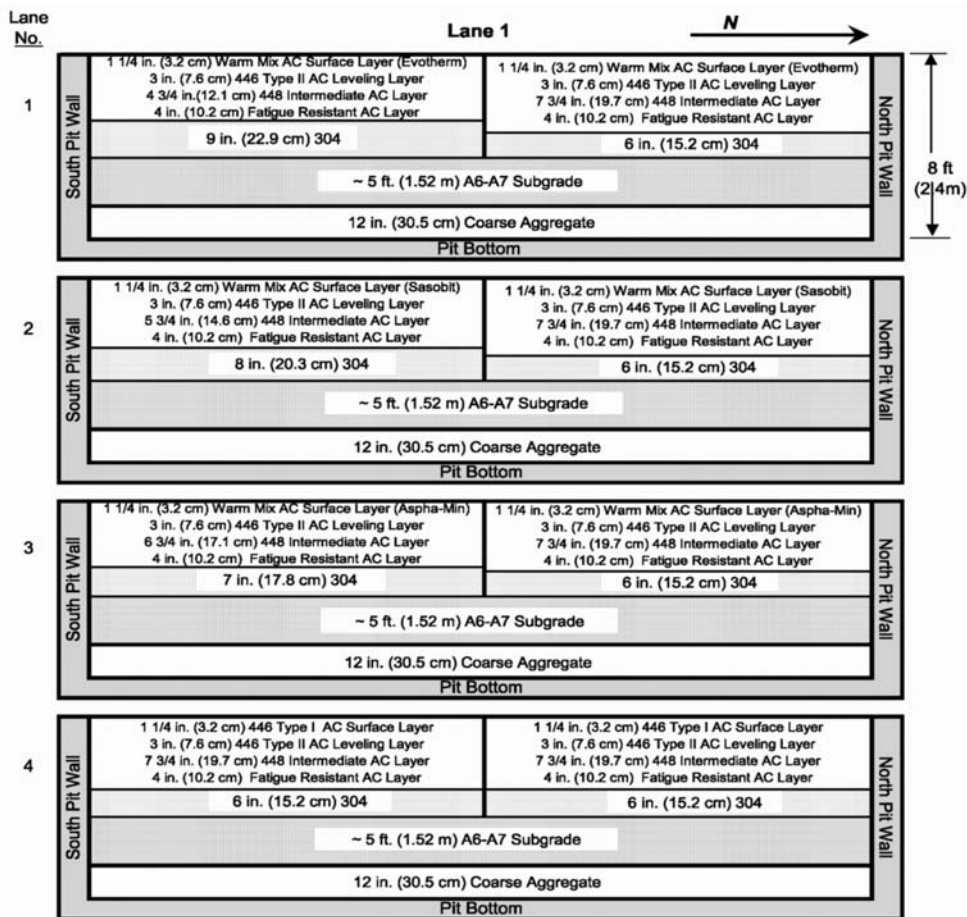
APLF test section profile view diagram showing pavement structure build-up in each 8 ft. (2.4 m) lane. The 3 ft. (0.9 m) pave margins at the outer edges of Lane 1 and Lane 4 are not shown.
